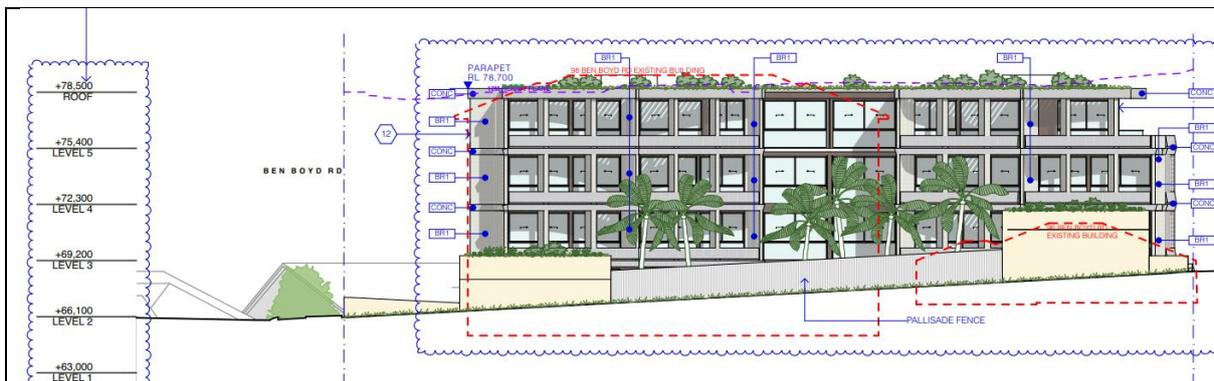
Approved Northern Elevation, DA 3000 Rev C
